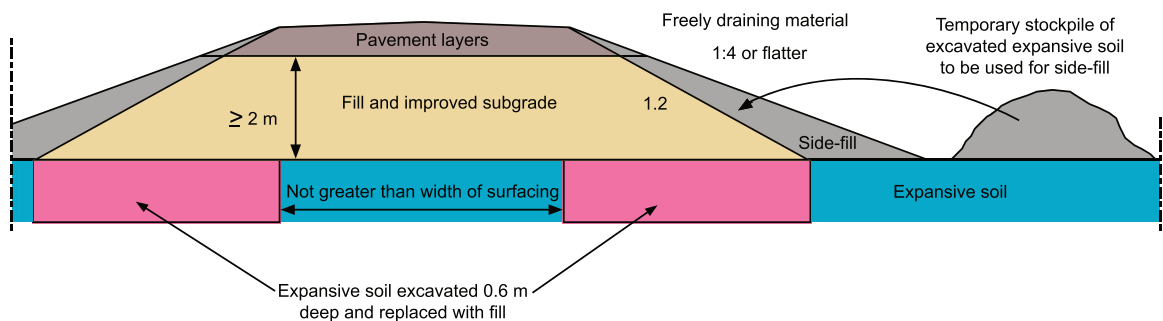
Construction on expansive soils (embankment height > 2 m)
